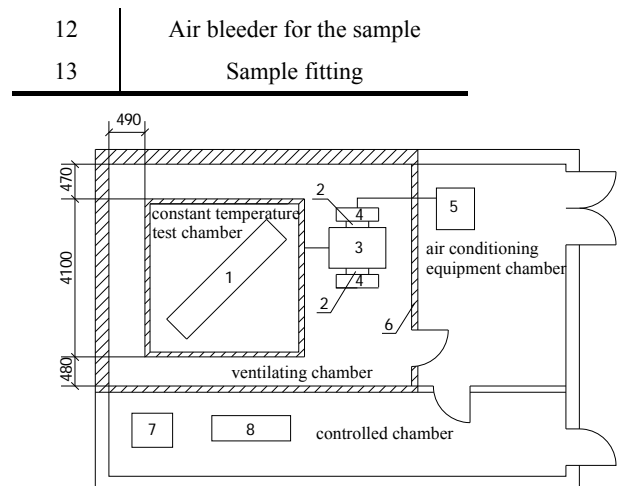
Sketch of test chamber for testing thermal properties of vacuum insulated heating pipeline
